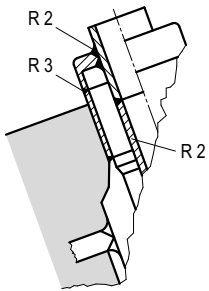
Example of pipe penetration of design type I with several fluid pipes and identification of design loading levels R1, R2 and R3
